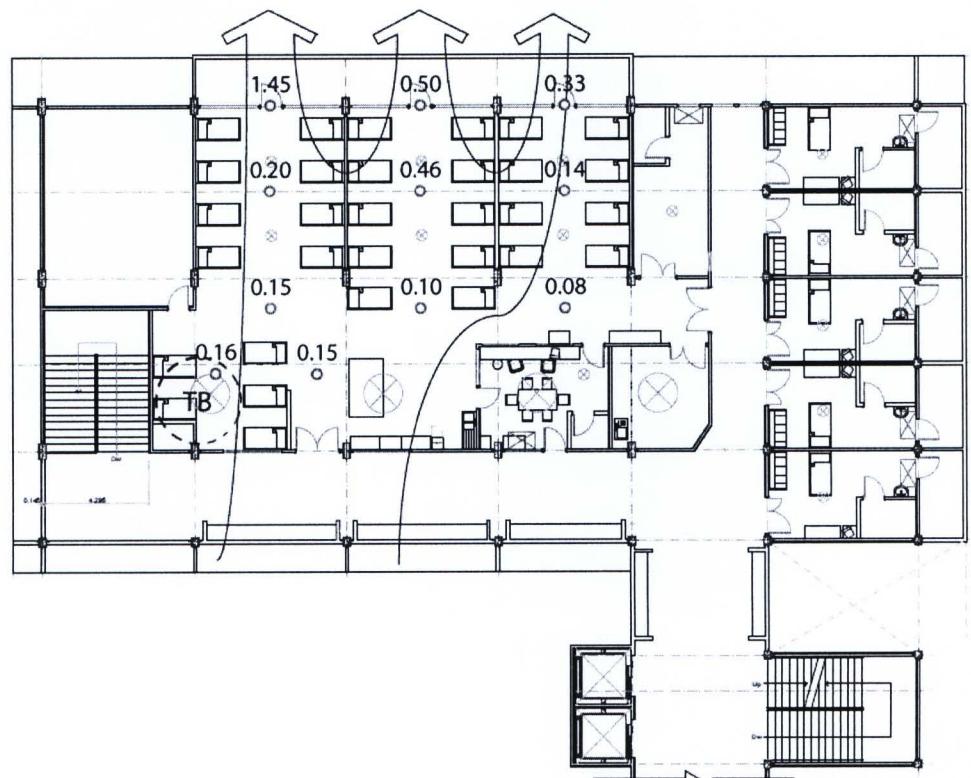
Floor plan and ventilation data of hospital E inpatient ward
